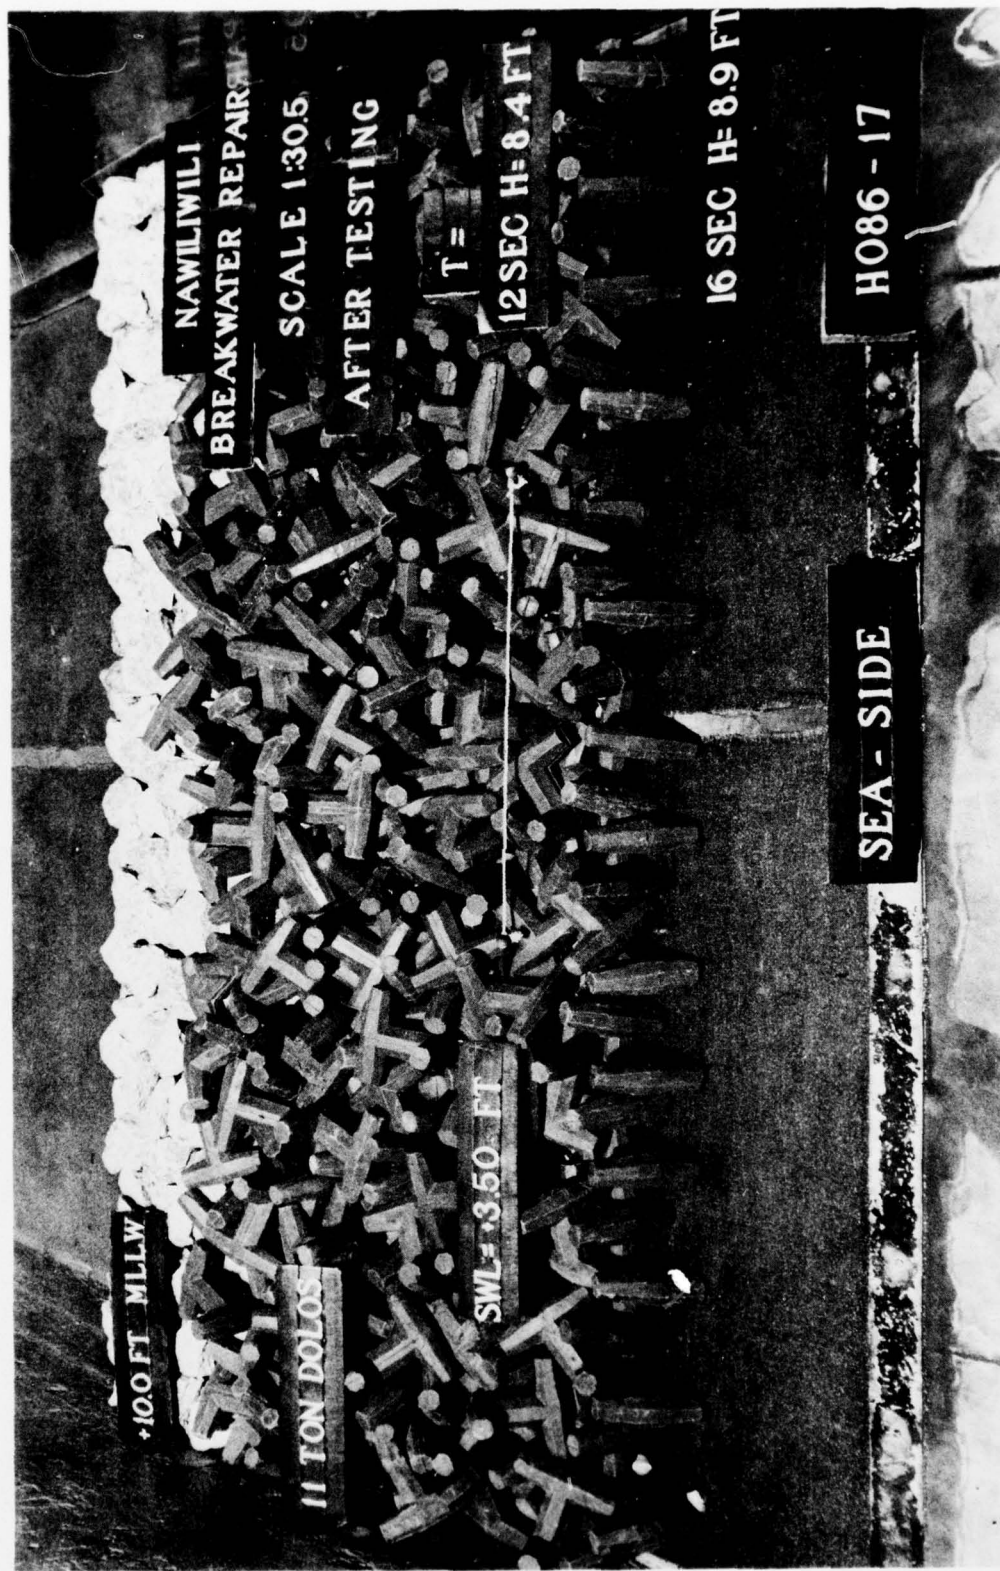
Sea-side view of test section 2 after testing with 12-sec, 8.4-ft and 16-sec, 8.9 ft waves at the +3.5 ft mllw swl
